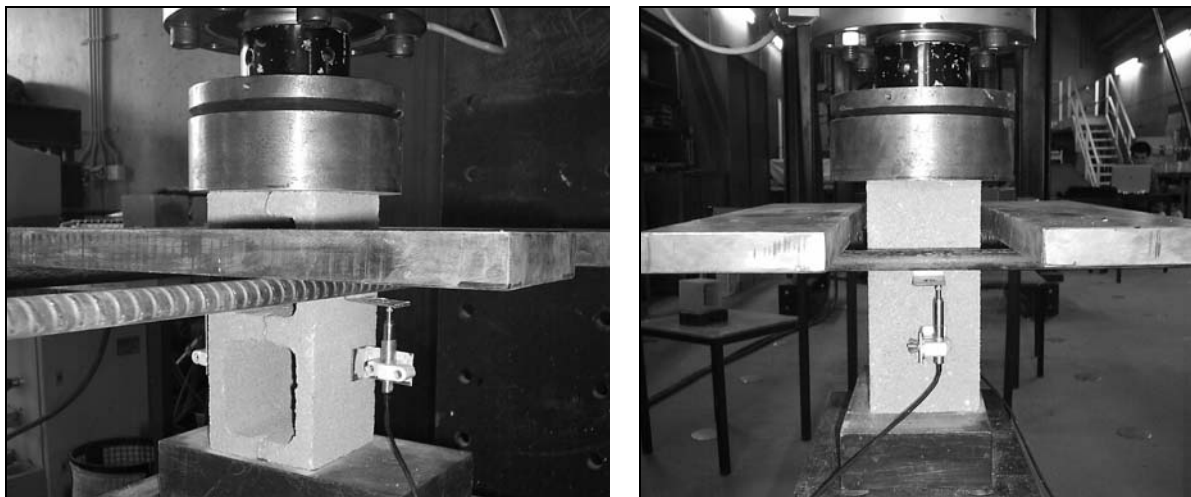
Test setup of the compressive tests in direction parallel to bed joints.
